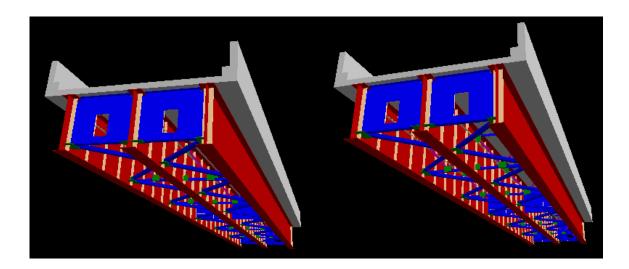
CG Images of a Steel Girder Bridge for Left and Right Eyes Respectively
